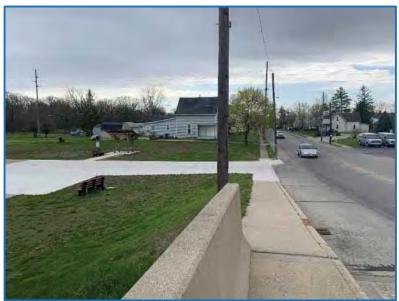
View from the SR 22 bridge facing south. The trailhead entrance, parking lot, and benches are visible. (04-22-20)
